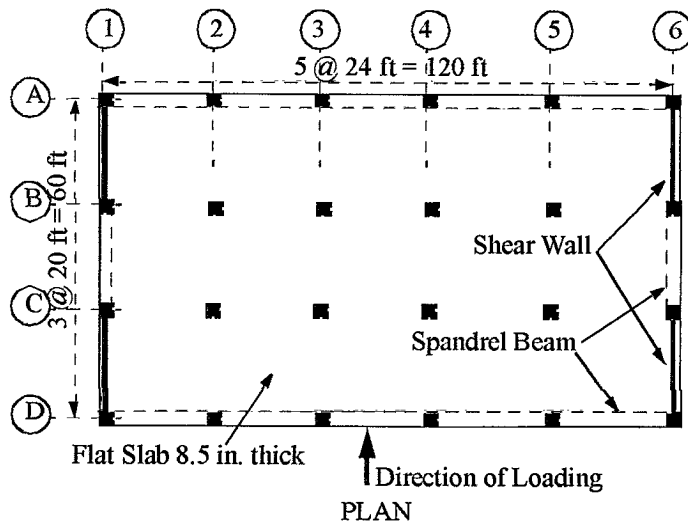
(a). Floor Plan of Residential Building Studied – Buildings #12 and #13
